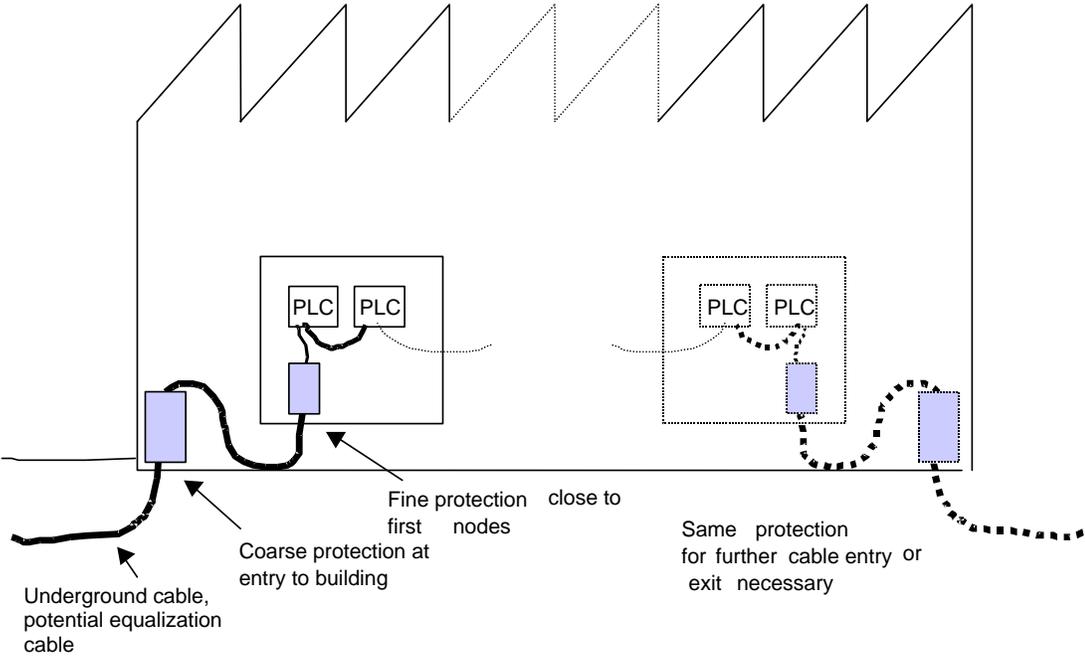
Lightning Protection Concept for LAN Cables Between Buildings
